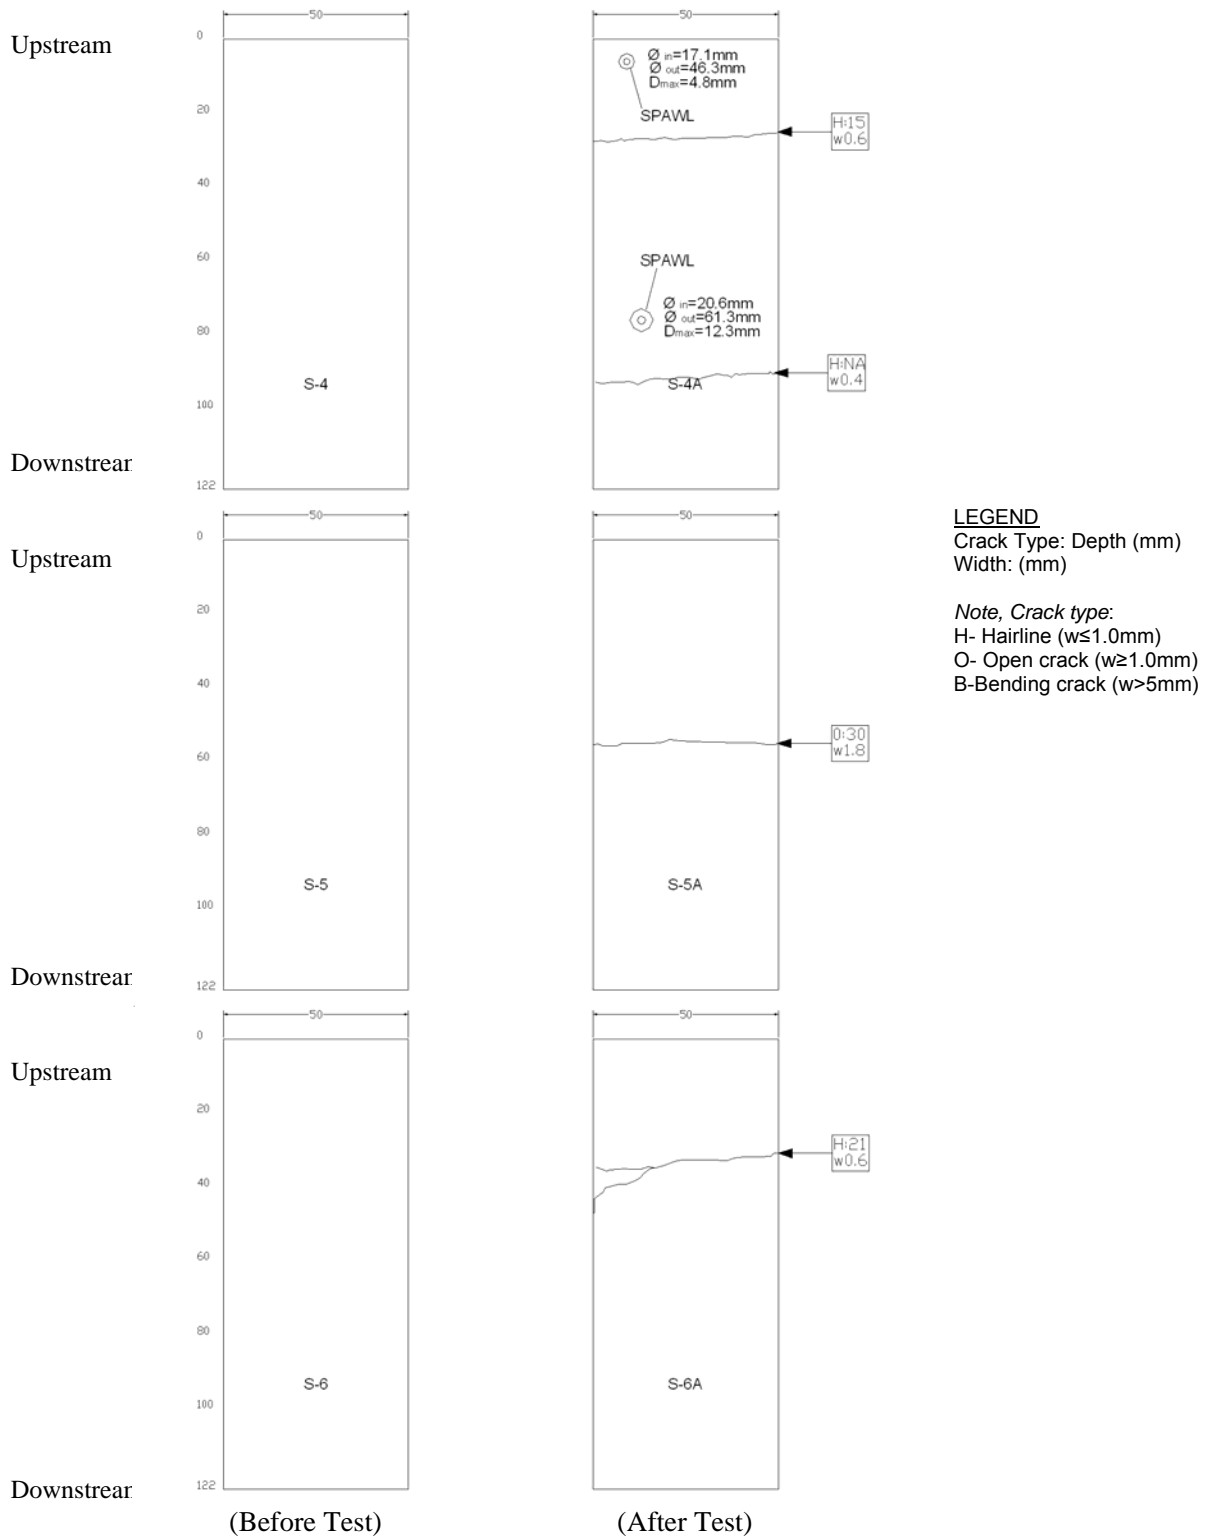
Crack observations-TSL coated concrete slabs S-4, S-5, and S-6
